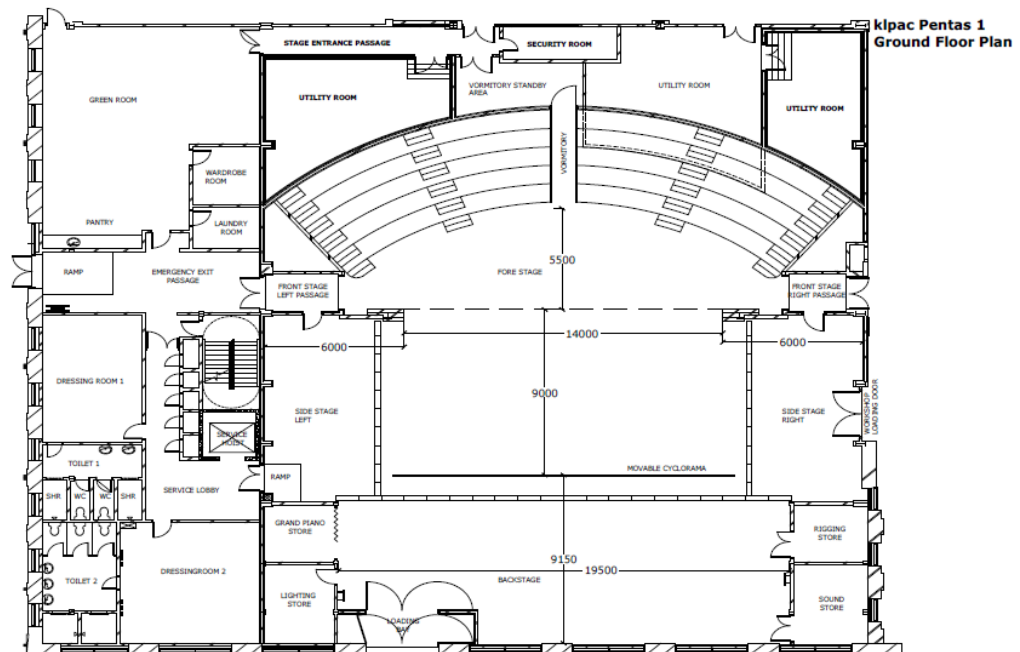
KLPAC Pentas 1 Floor Plan. Source: Kuala Lumpur Performing Arts Centre
